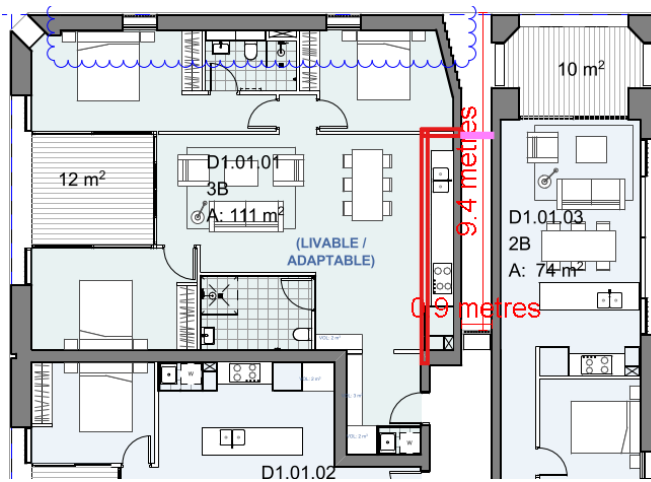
Building D1 corridor requiring a design modification condition, with the recommended configuration outlined in red
